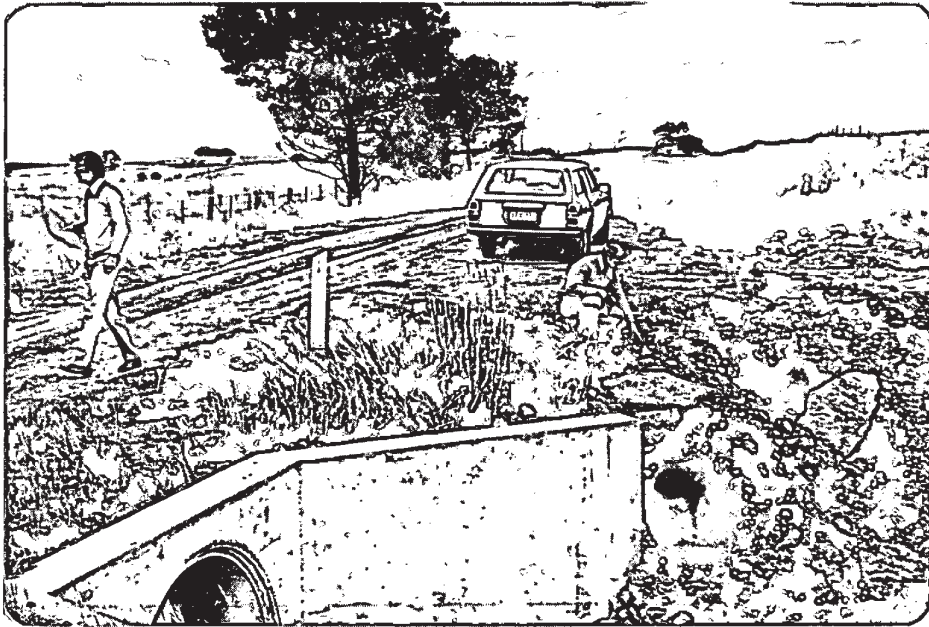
Tunnel erosion by the side of a culvert on Sixth Avenue immediately south of First Avenue.
